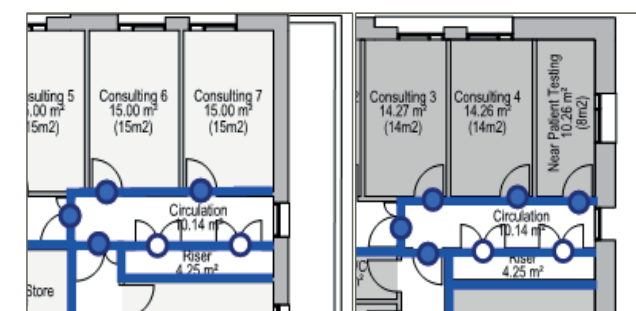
Dead ends in corridors: ground floor (left) and first floor (right)
